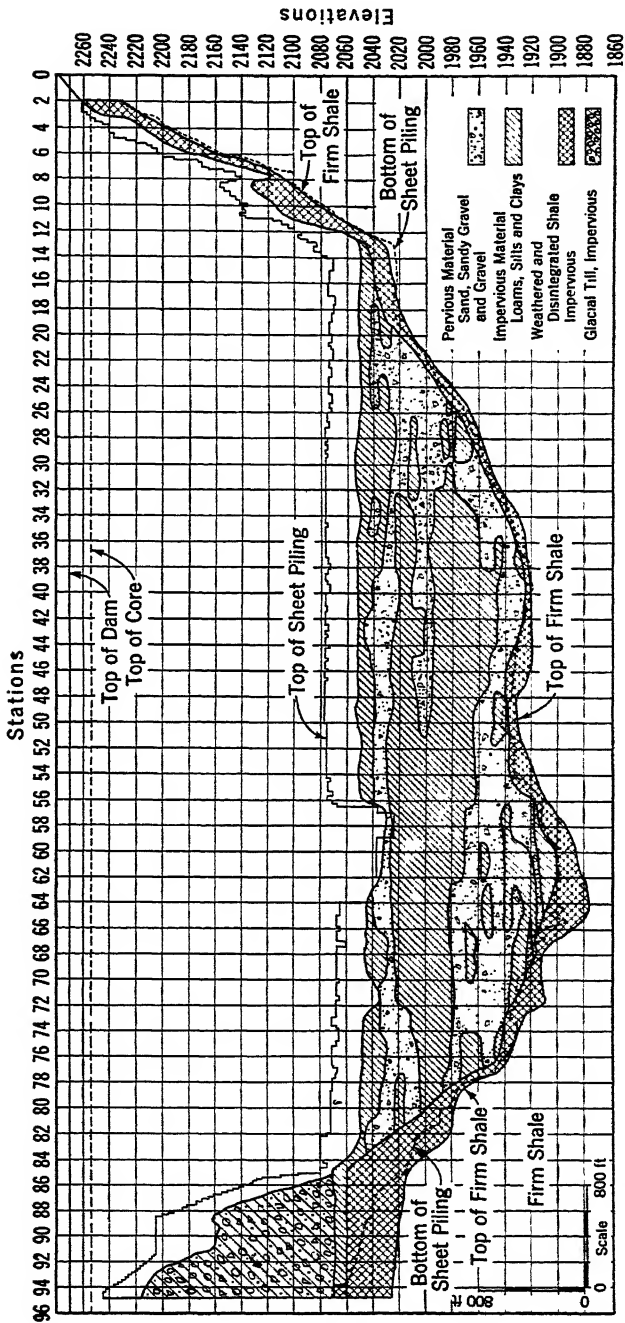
Cross-section of Fort Peck dam site, looking downstream.
